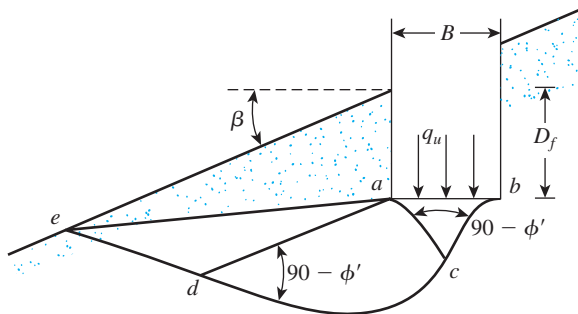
Nature of plastic zone under a rough continuous foundation on the face of a slope
